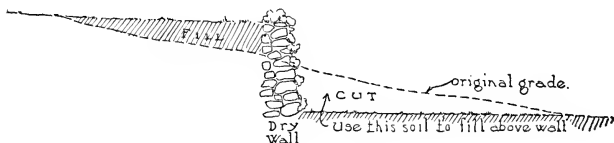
A dry wall can sometimes be used as a retaining wall where the cut is not too deep and the amount of soil to be held not too great. This sectional diagram suggests such a use
